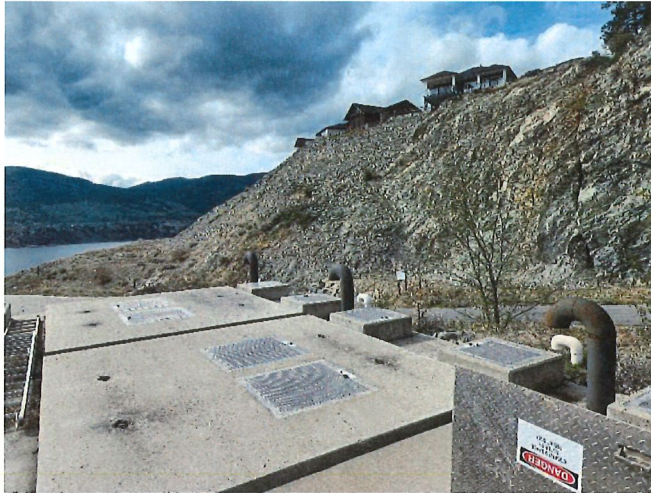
Vintage Views WWTP: Existing concrete roof slab of the reactor
